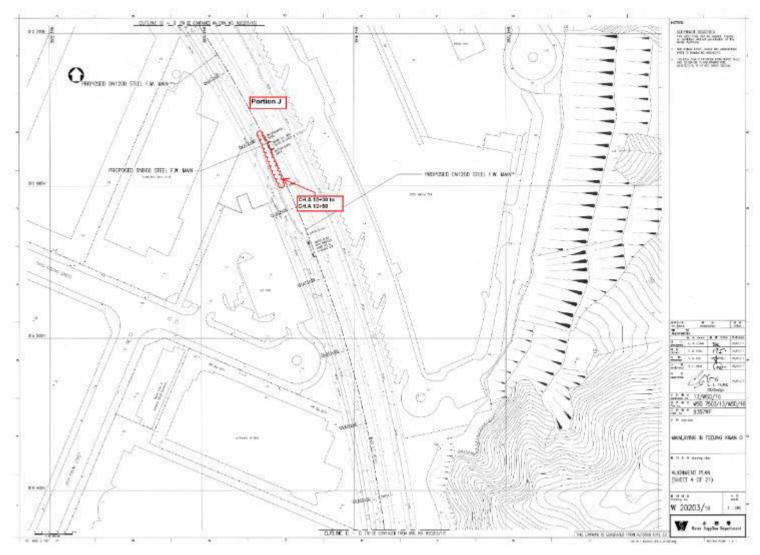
Location Plan for Portion J - CH.A 12+30 to CH.A 12+50
